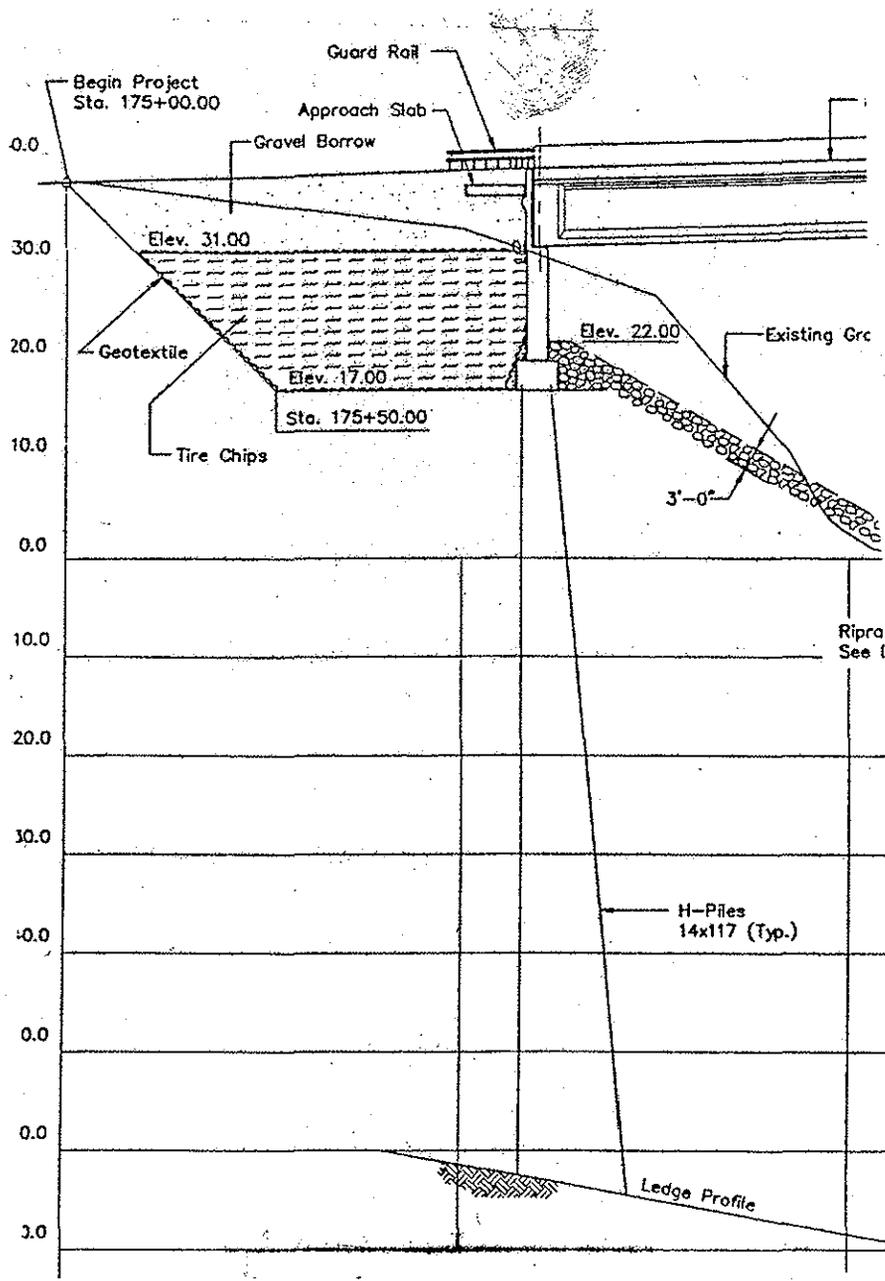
Tire shreds used as lightweight backfill on Topsham-Brunswick Bypass project constructed in 1996 by the Maine DOT
